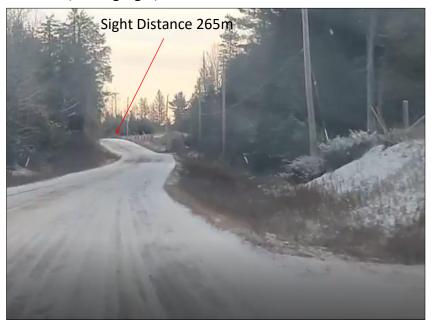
Alternative Access 1 (EA1) Looking East (265m SD)
